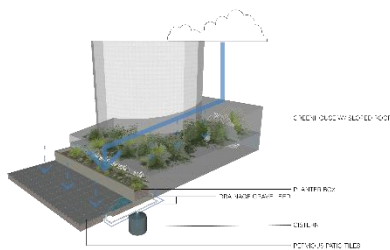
Site rendering of Towers Green Atrium stormwater runoff capture via cistern for reuse in high water use buildings.
